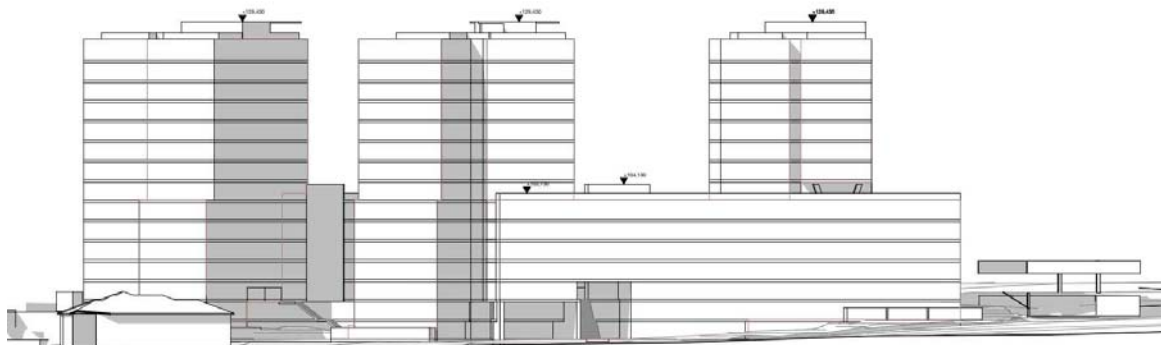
Concept building elevations – Ray Road elevation (Source: Bennett and Trimble)
